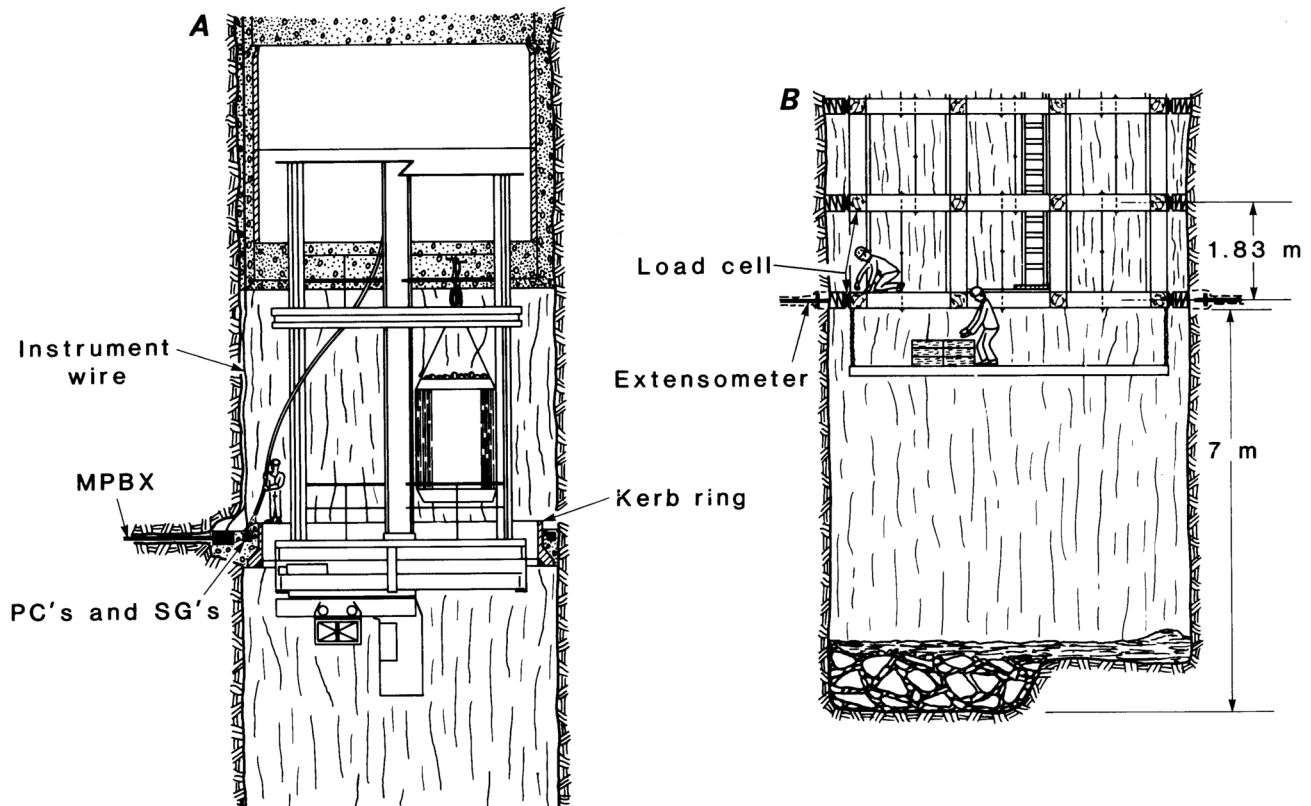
Typical Installation of (A) PC's, (B) SC's in a concrete lining, and (C) flat compression load cells in timber sets in rectangular shaft.
